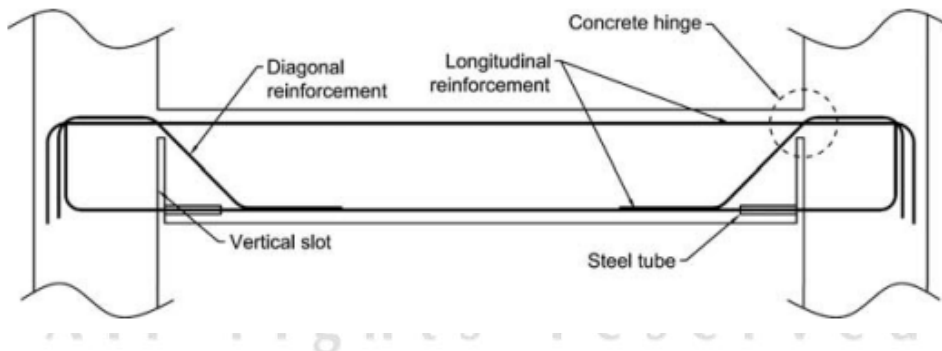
Single slotted-beam (SSB) (Oudah and El-Hacha, 2016)
